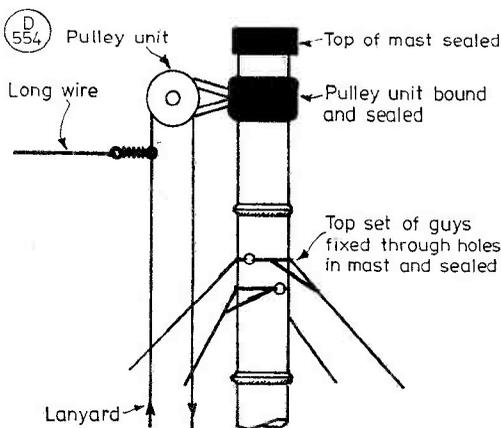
TOP GUYS PULLEY UNIT & LANYARD DETAILS
